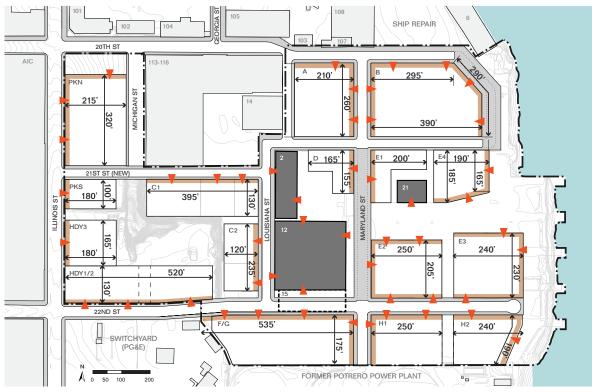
Illustrative Plan of Building Entries from Public Right of Way Note: All dimensions are rounded up to the nearest 5'.
